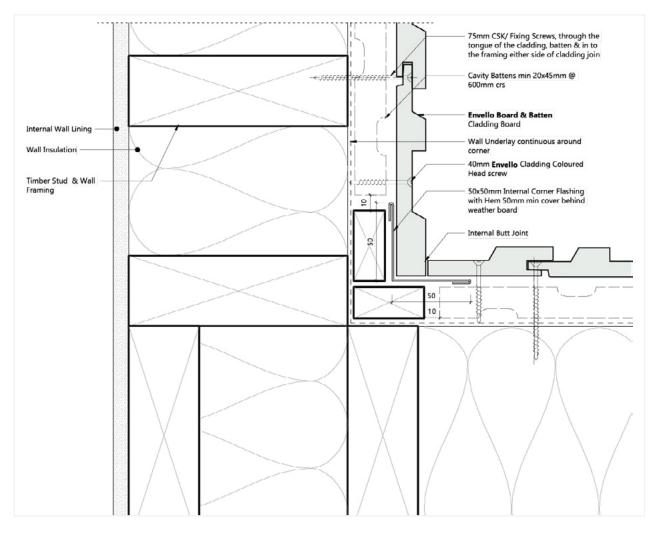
INTERNAL BUTT JOINT DETAIL
